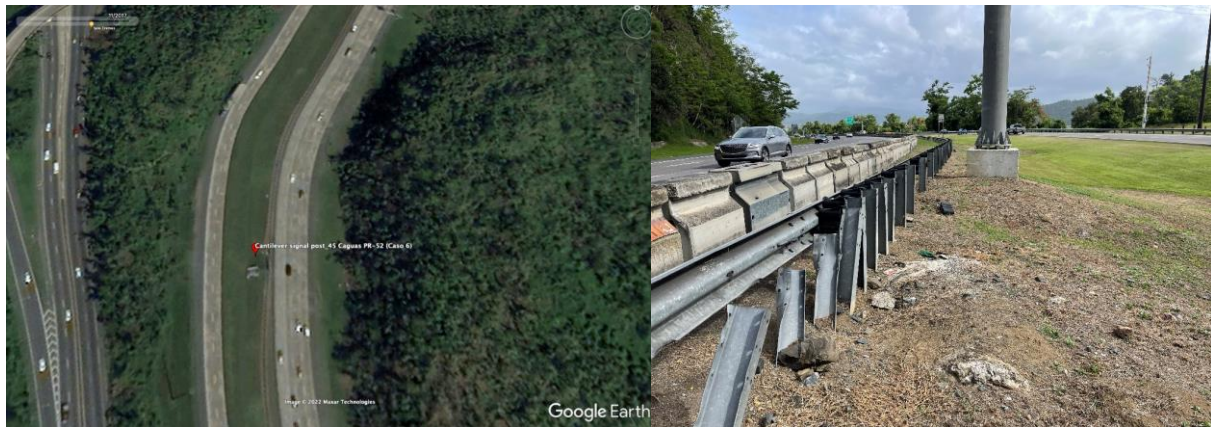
Photos of Cantilever Traffic Sign Geolocation, damages to the traffic barrier, and Rests of a Post Foundation at P-45. Location: 18.27035278N; -66.03955556W
